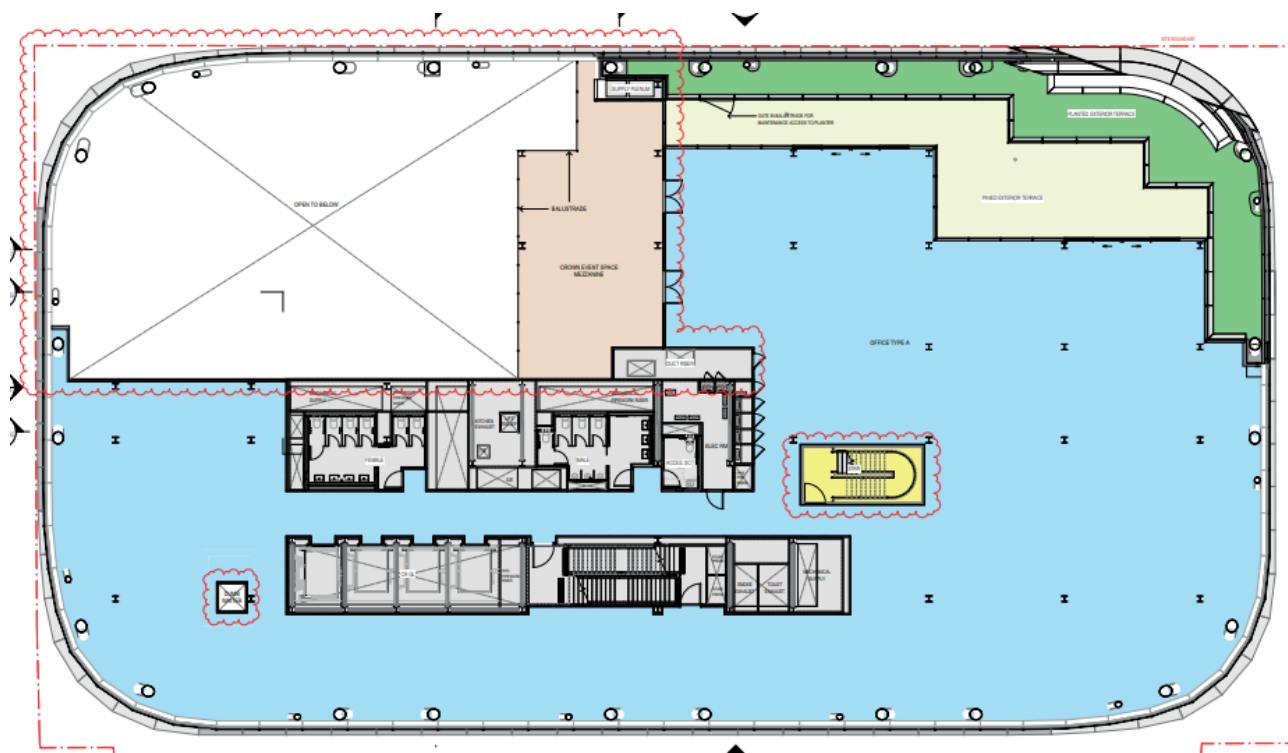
Proposed Crown Event Space Amendments on Level 35 and 36
